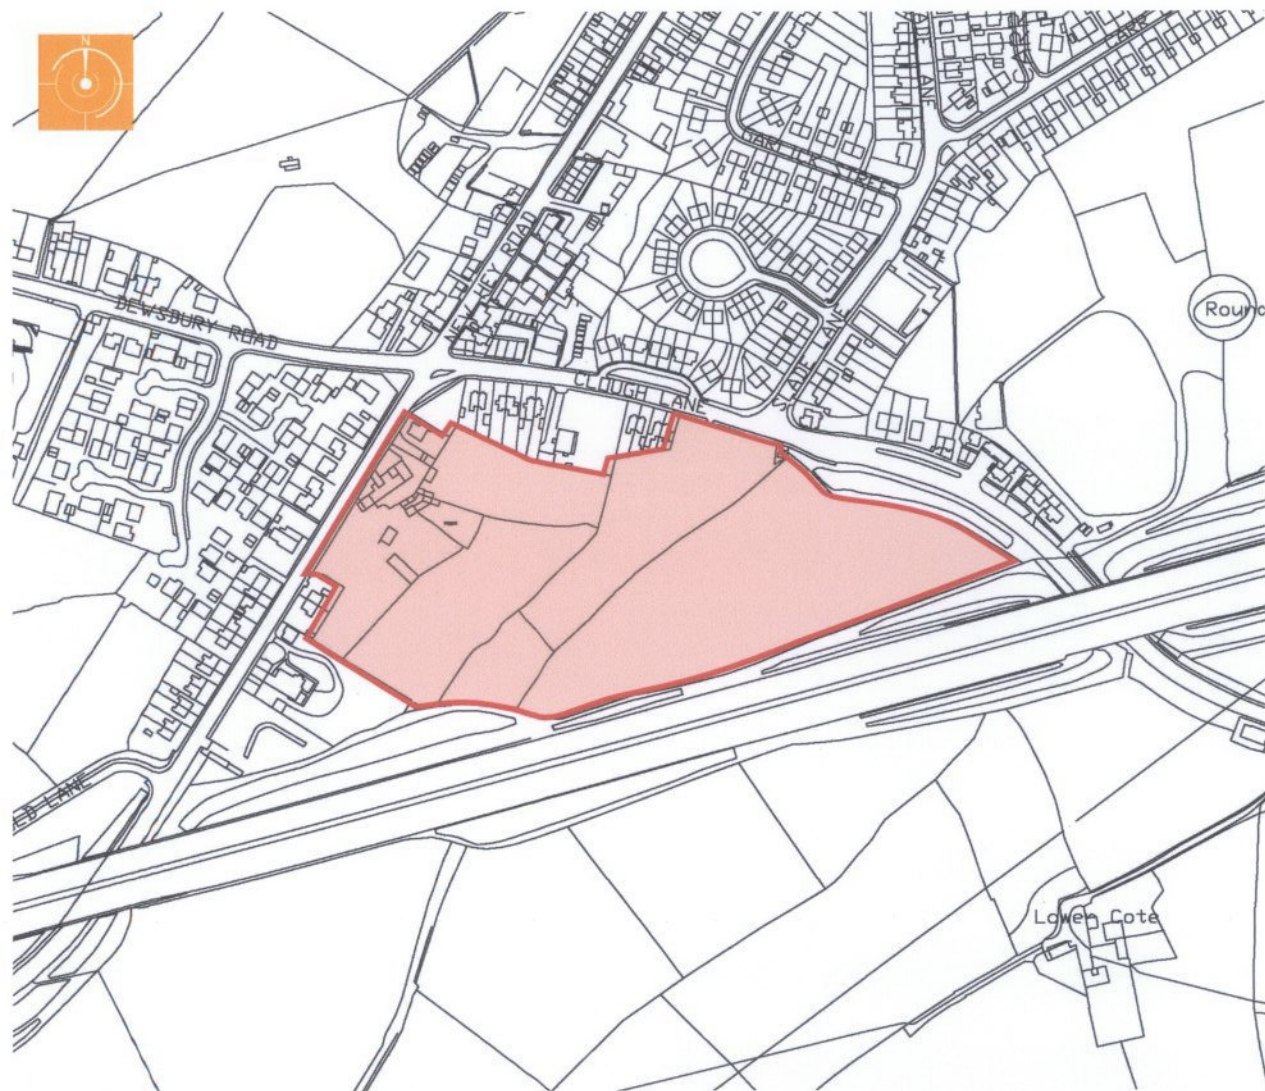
Site area plan - 11.44 acres / 4.63 ha
